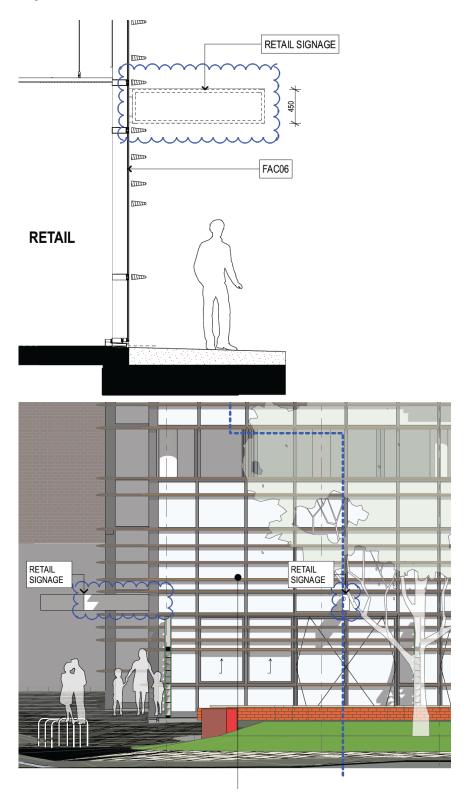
Proposed retail signage to ground floor – northern elevation looking south down Kensington Street
